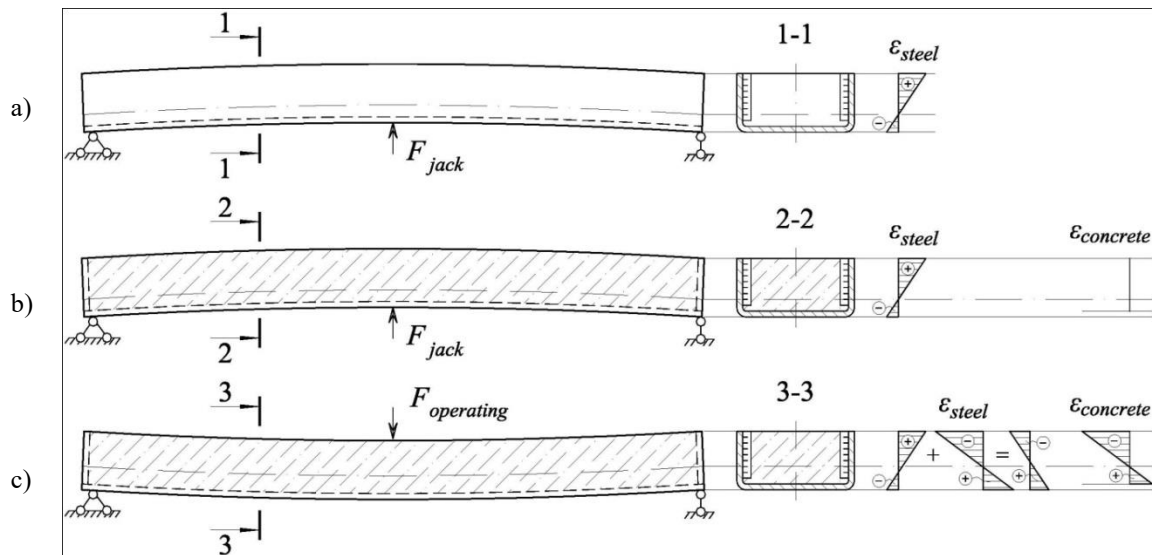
Stages of a prestressed reinforced concrete rod work:
